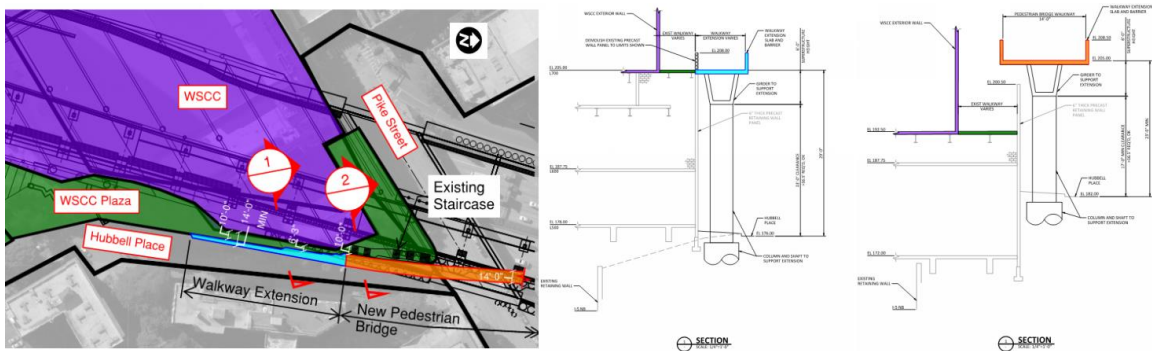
Path Widening and Pedestrian Bridge Over Pike Street
